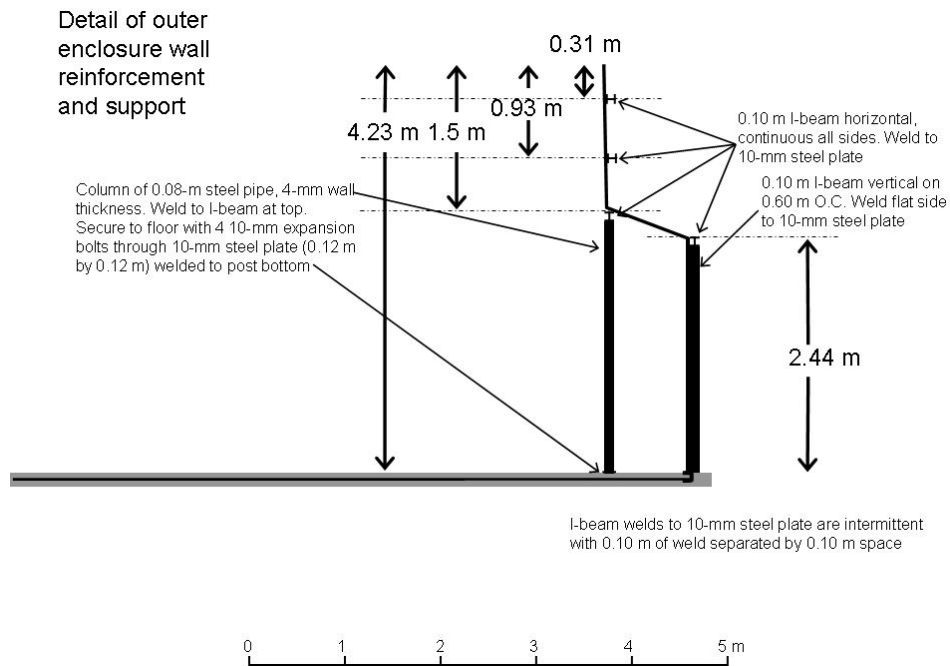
Detail of outer enclosure and roof reinforcement and support.
